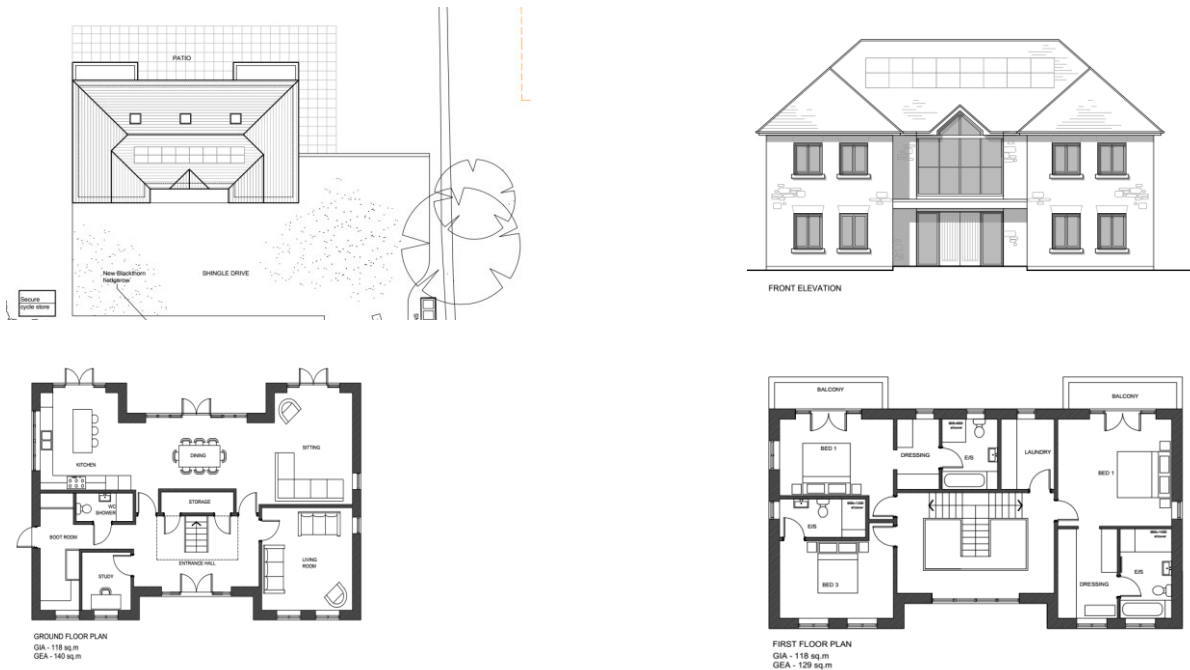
Proposed new build replacement dwelling - 81 Swallow Hill Road, S75 1LY.
